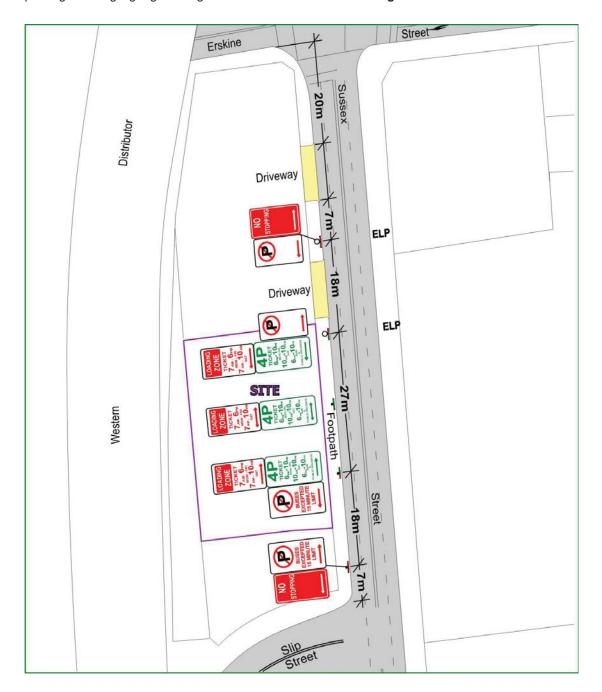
Proposed On-Street Loading & Parking Conditions along the Site Frontage
